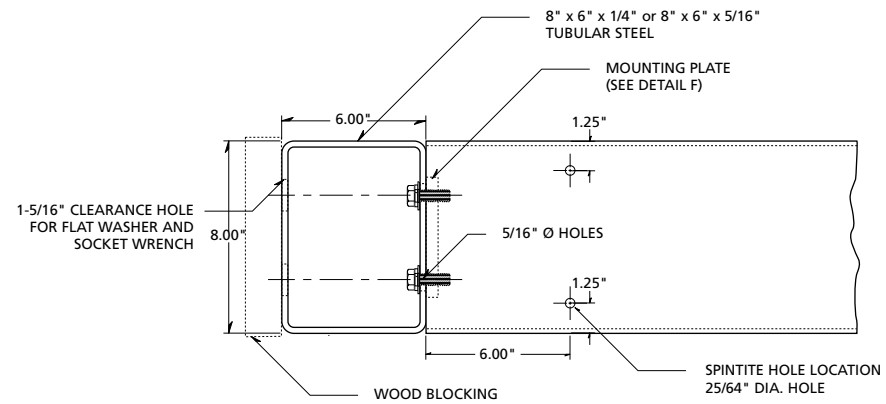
DETAIL POST ASSEMBLY 6 x 4 SIDE ELEVATION
